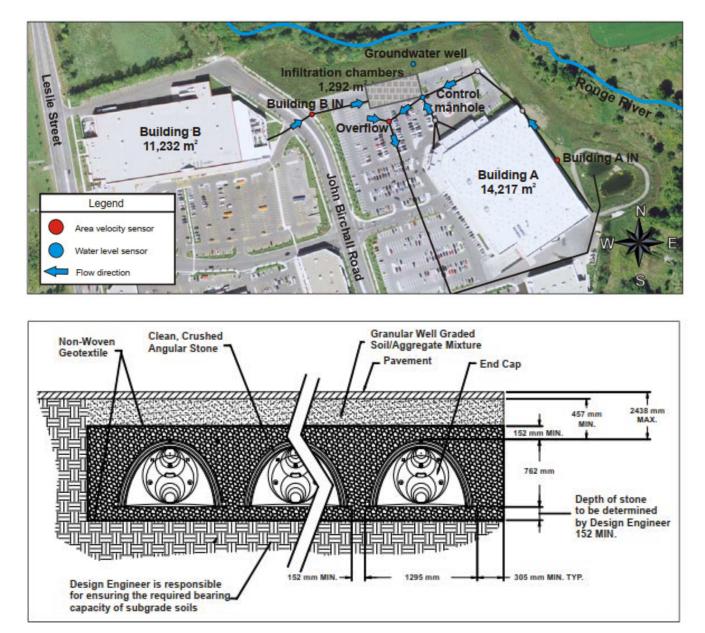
Elgin Mills Stormwater Infiltration System Plan and Cross Section
